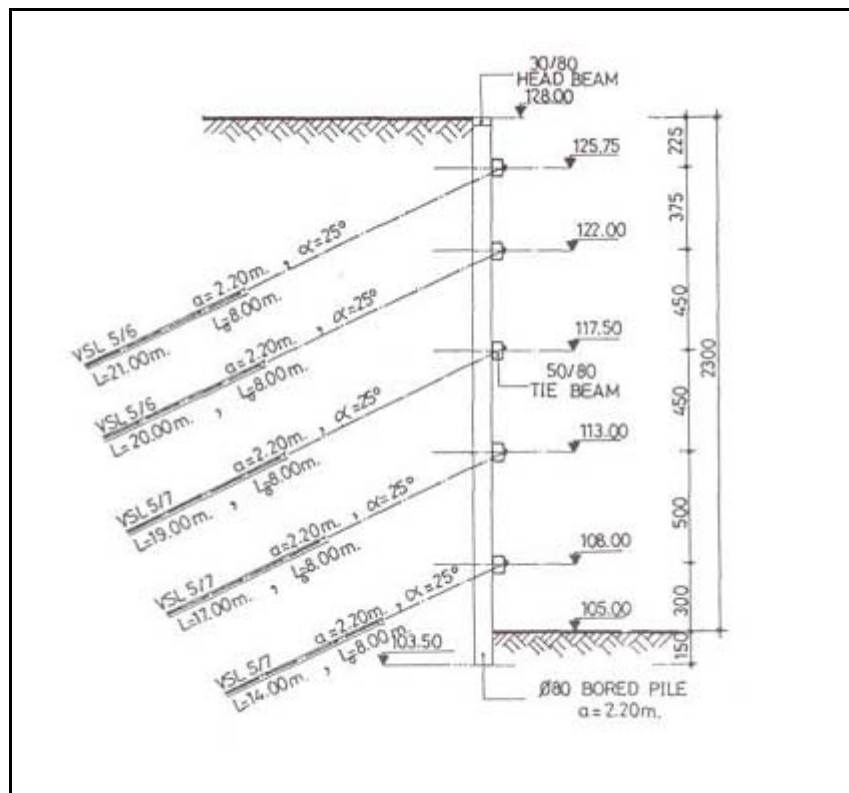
Tied back cast in-situ bored pile application on the deep excavation of Sabanci Towers (Candogan and Saglamer, 1991)
